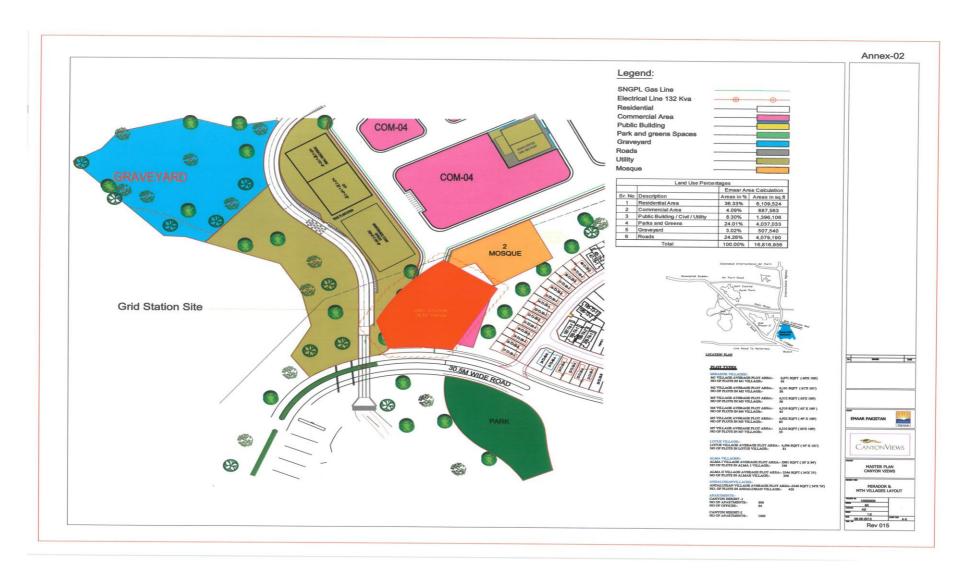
Layout Plan of EMAAR 132 KV Grid Station
